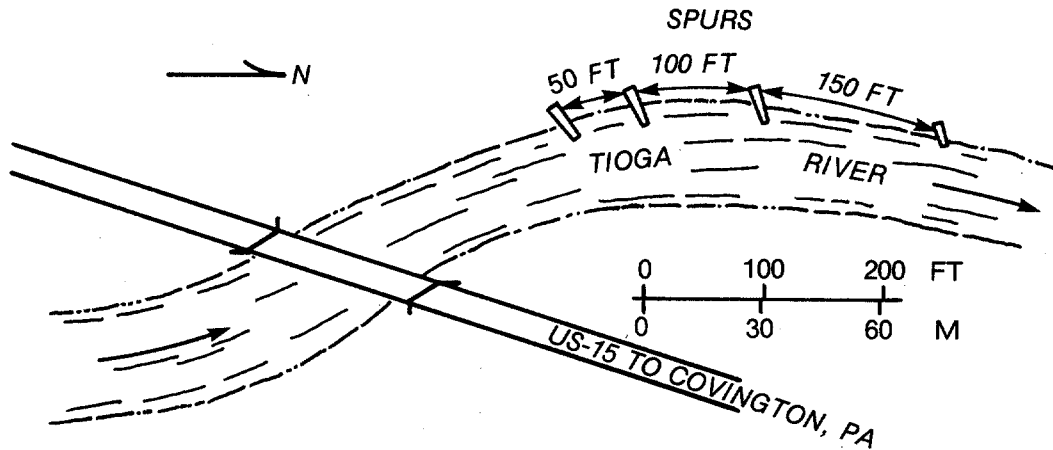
Plan sketch showing position of spurs, US-15 near Covington, PA.
